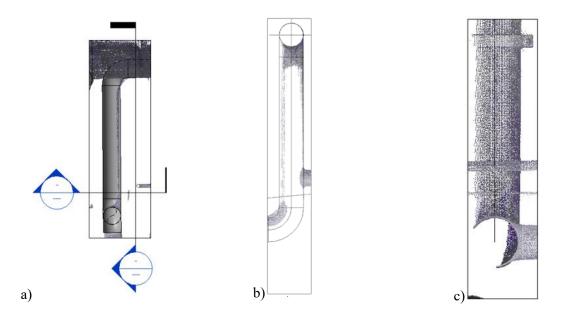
One pipe segment in three different views: a) Floor plan, b) Section view, c) Section view
